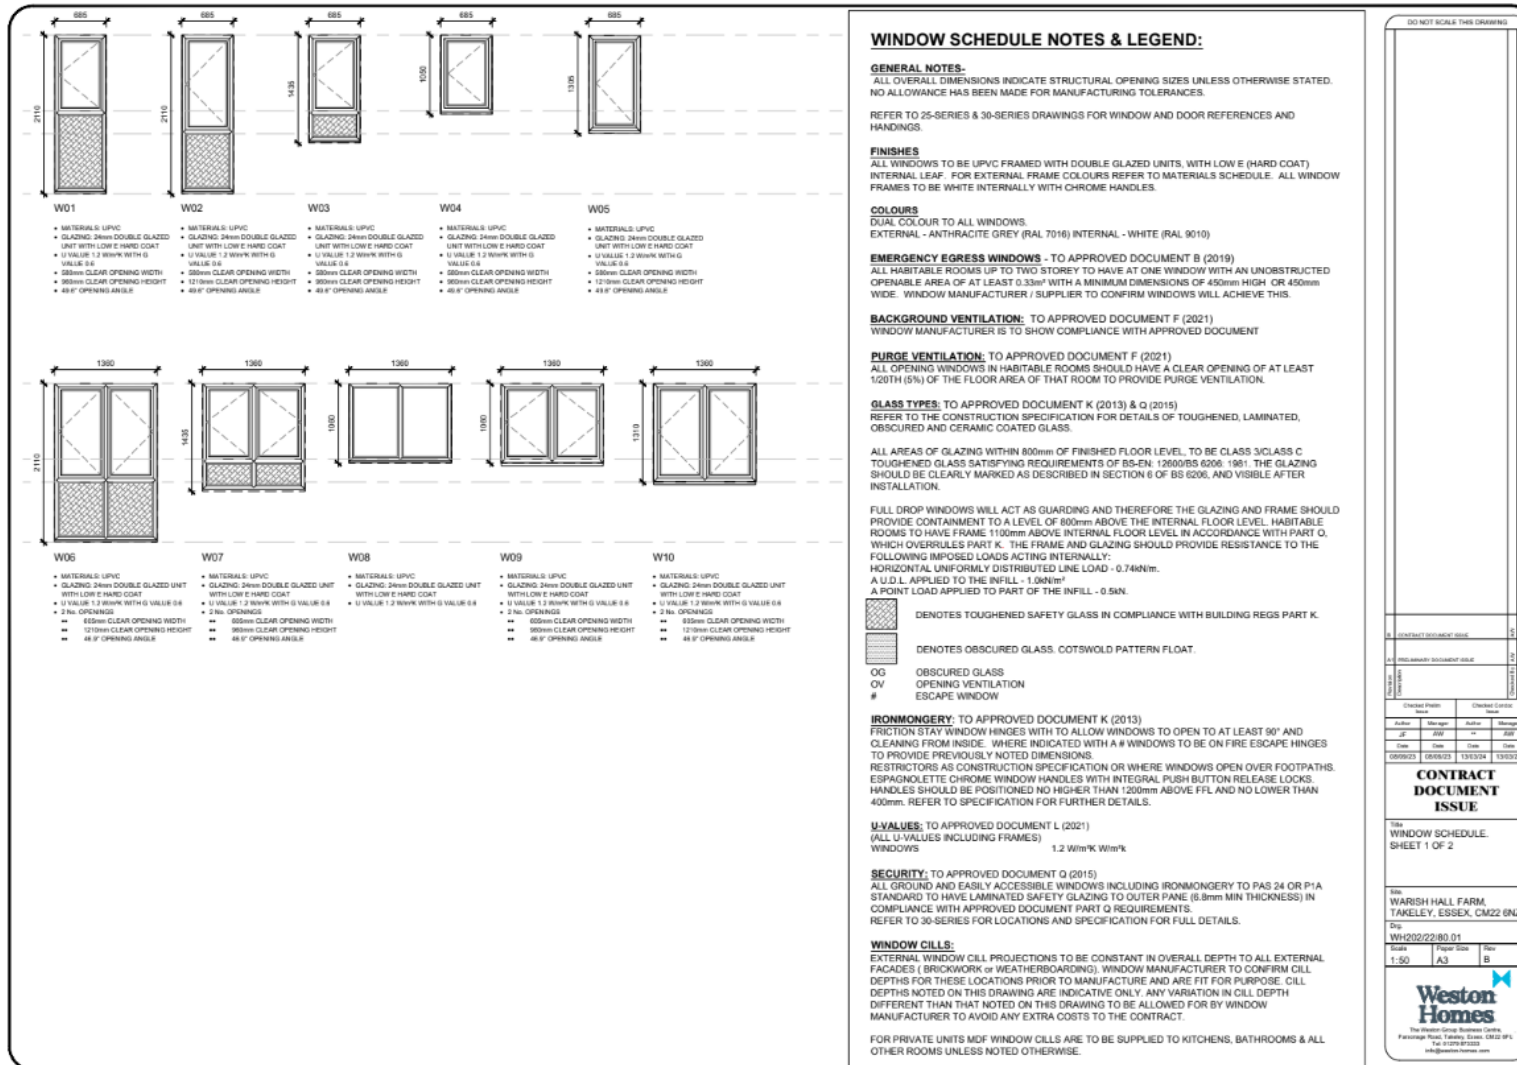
Glazing Drawing WH202/22/80.01 – Jacks Lane
